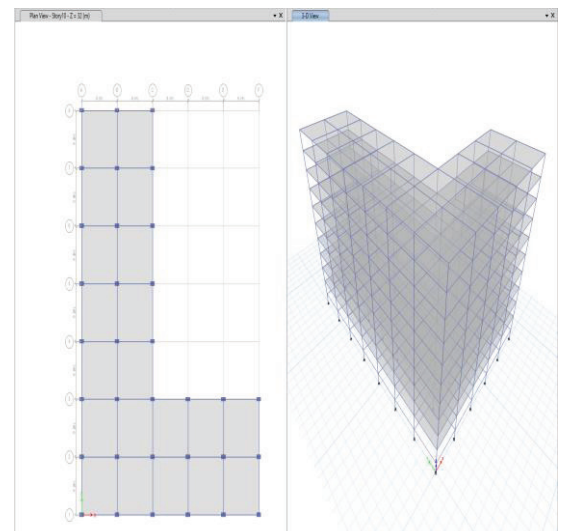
Plan and Isometric view of Model-3 with LRB G+10
